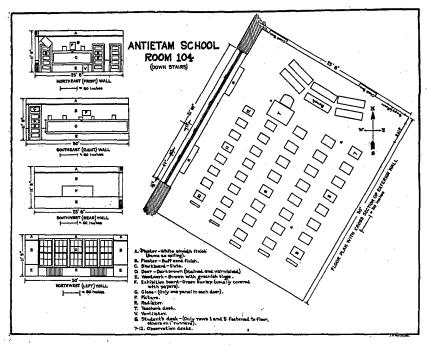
Floor plan and elevation of the four walls of room 104
